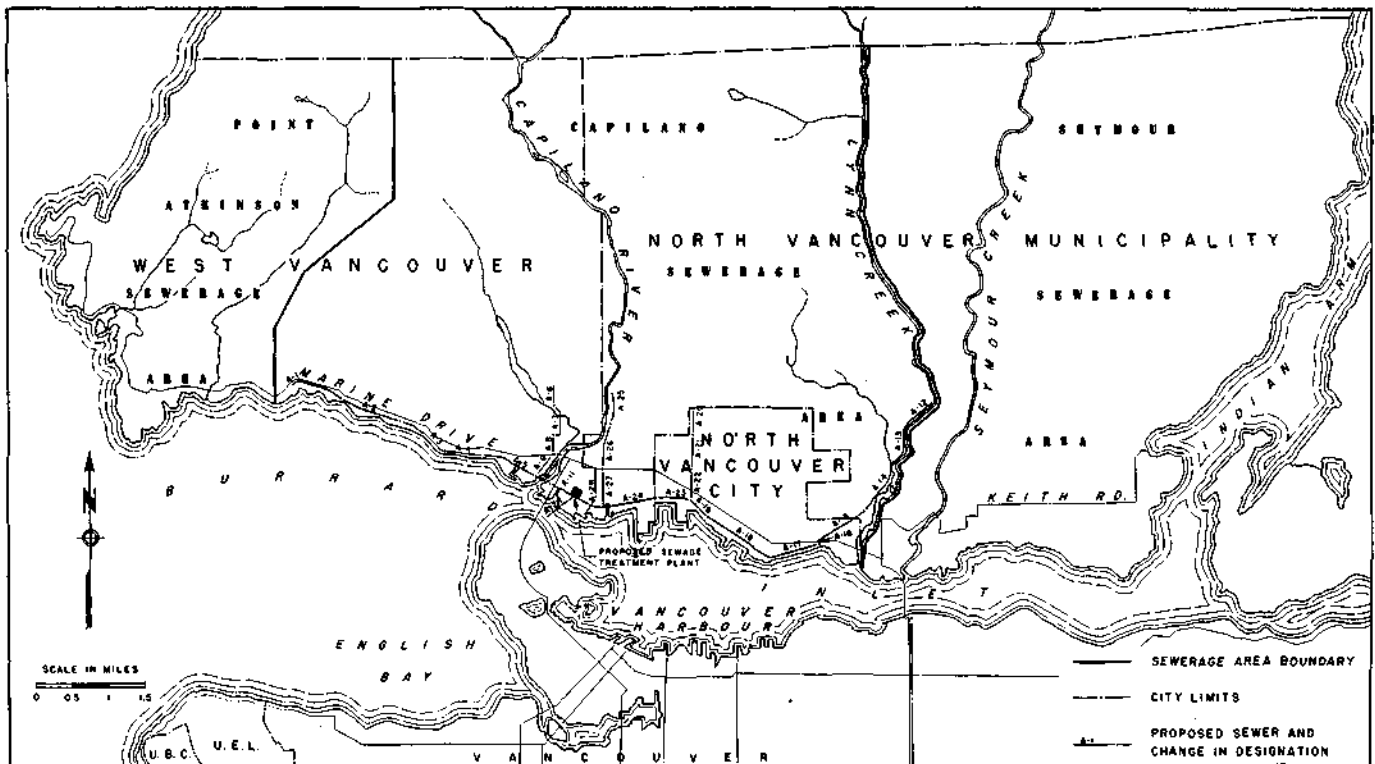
Proposed Layout of Plan A - Capilano Sewerage Area
